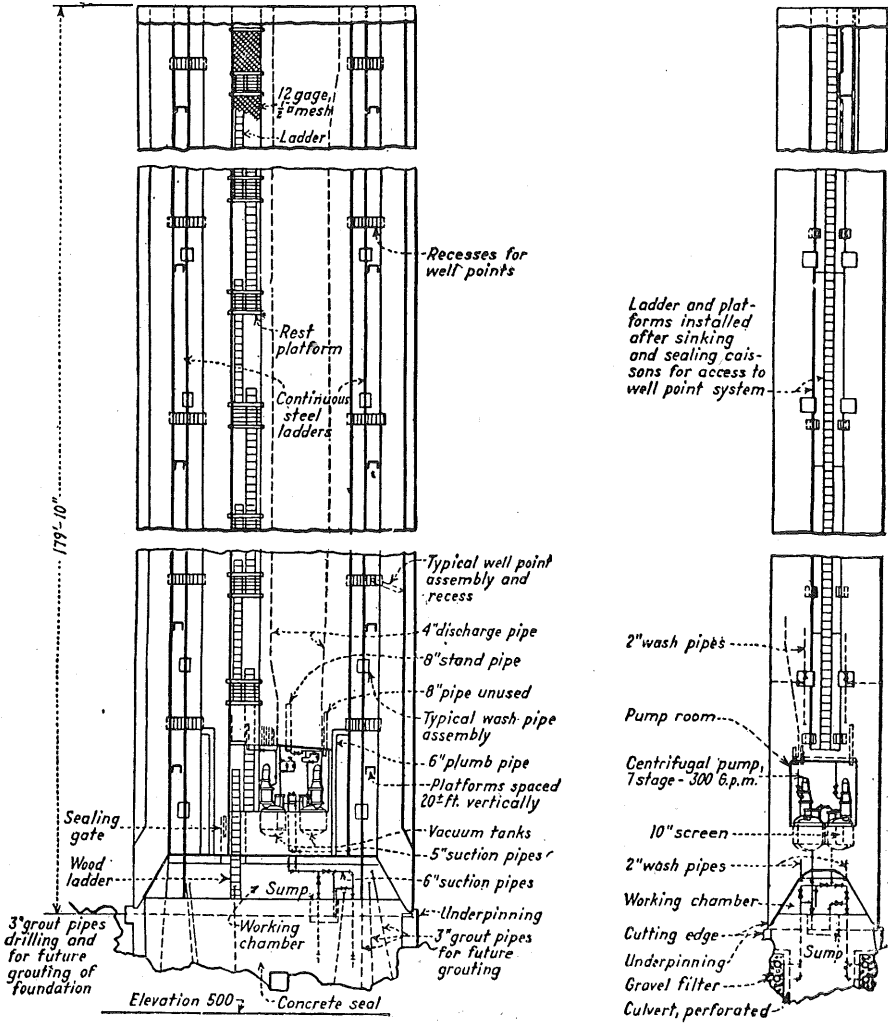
DETAILS OF PNEUMATIC CAISSONS FOR CUT-OFF WALL SHOWN IN FIG. 140.
